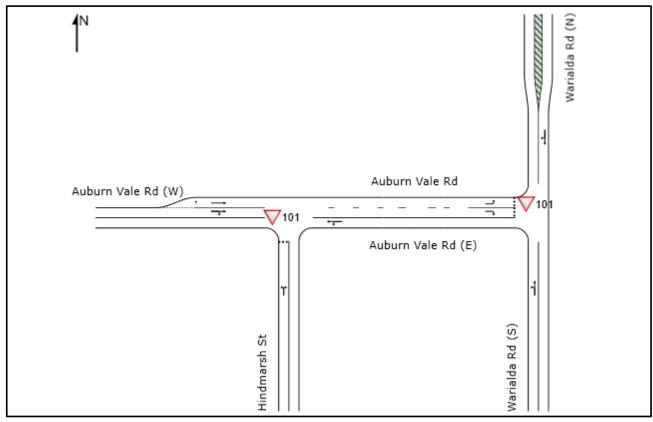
Existing Warialda Road / Auburn Vale Road / Hindmarsh Street Intersection SIDRA Layout
